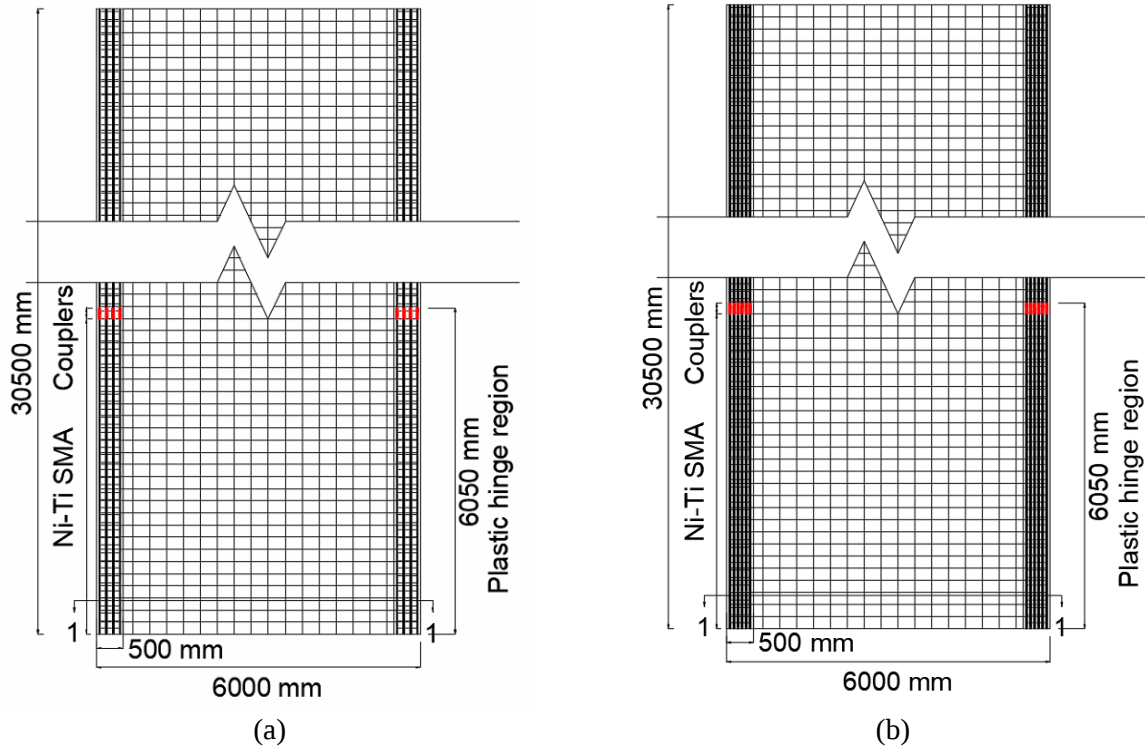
Elevation of hybrid SMA-steel reinforced concrete shear walls: (a) Wall MDHW and (b) Wall DHW
